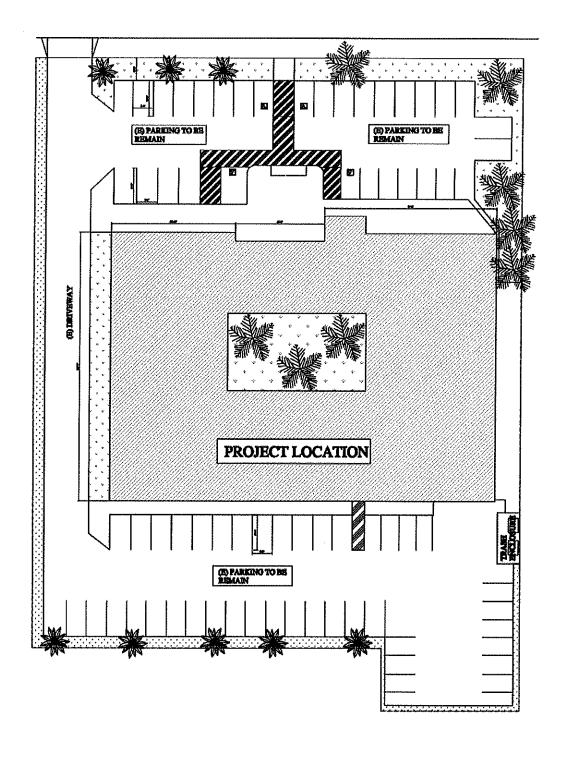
SITE PLAN SOURCE: TRAN DESIGN
